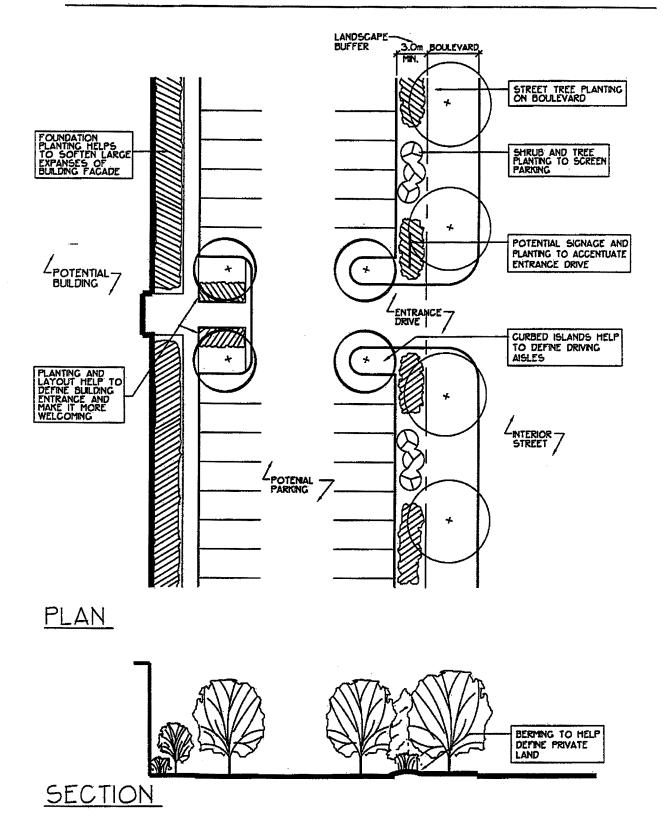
• STREETSCAPING ON PRIVATE LAND ADJACENT TO INTERIOR STREET
